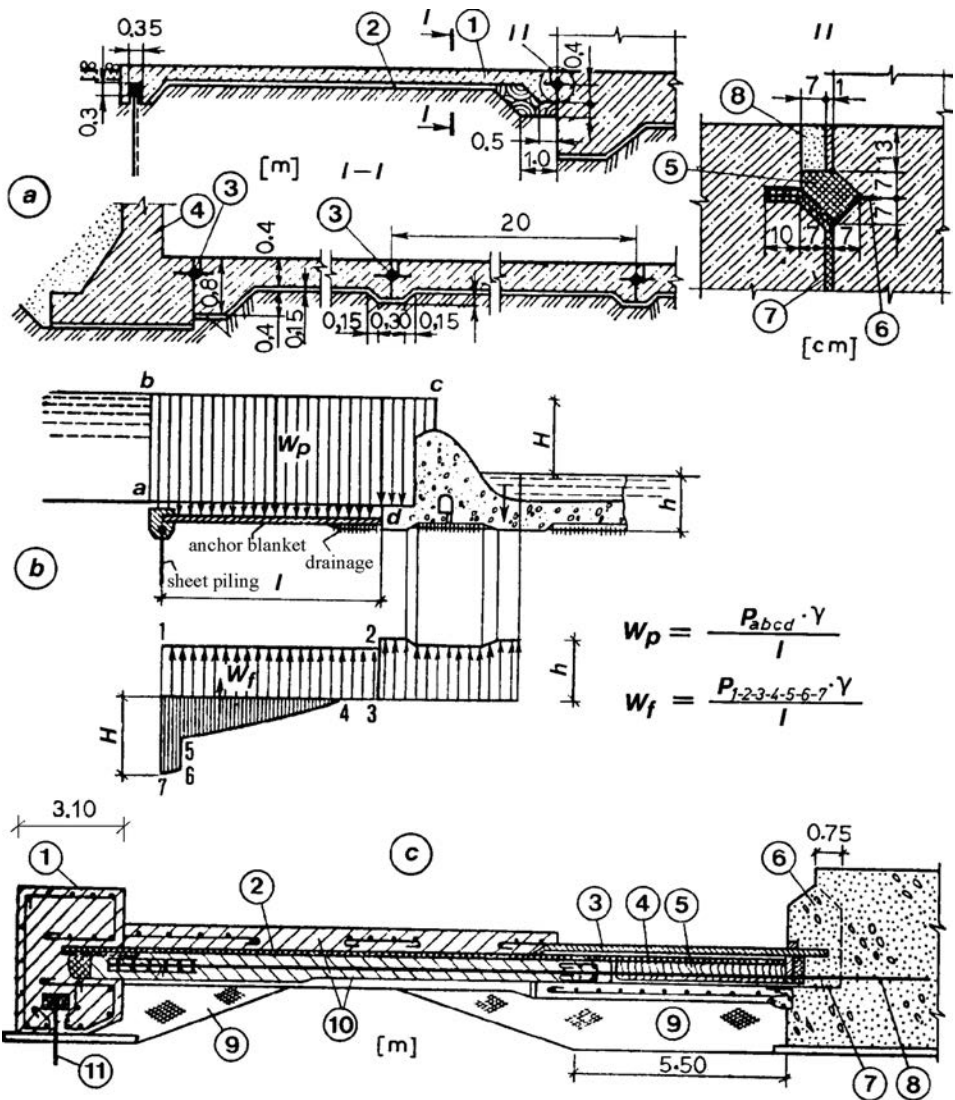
Rigid upstream blanket. (a) Reinforced concrete blanket over loam bedding: (1) reinforced concrete slab 40 cm; (2) concrete bedding 5 cm; (3) closing of the joint; (4) retaining wall; (5) asphalt mastic; (6) steel sheet; (7) bituminous waterproof paper; (8) cement mortar. (b) Scheme for dimensioning of anchor blanket. (c) Anchor blanket: (1) beam; (2) bituminous waterproof paper; (3) three rows of boards on waterproofing; (4) bitumen; (5) asphalt mastic. (6, 7) additional concreted part of the dam's body; (8) steel anchor; (9) clay; (10) reinforced concrete slab; (11) sheet piling.
